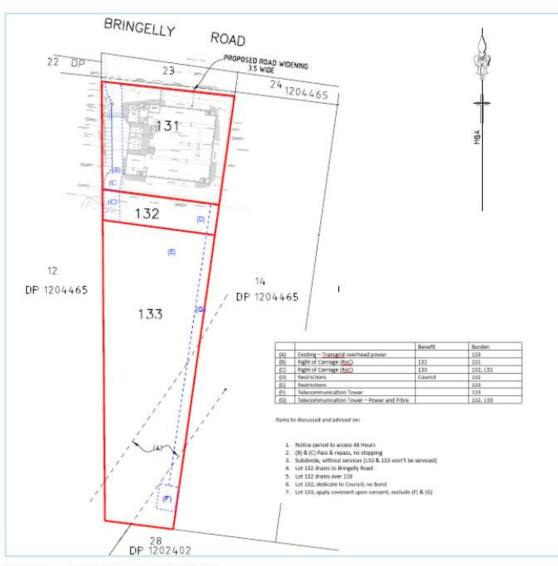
Plan of Proposed Subdivision Source: Nearmap and Ethos Urban
